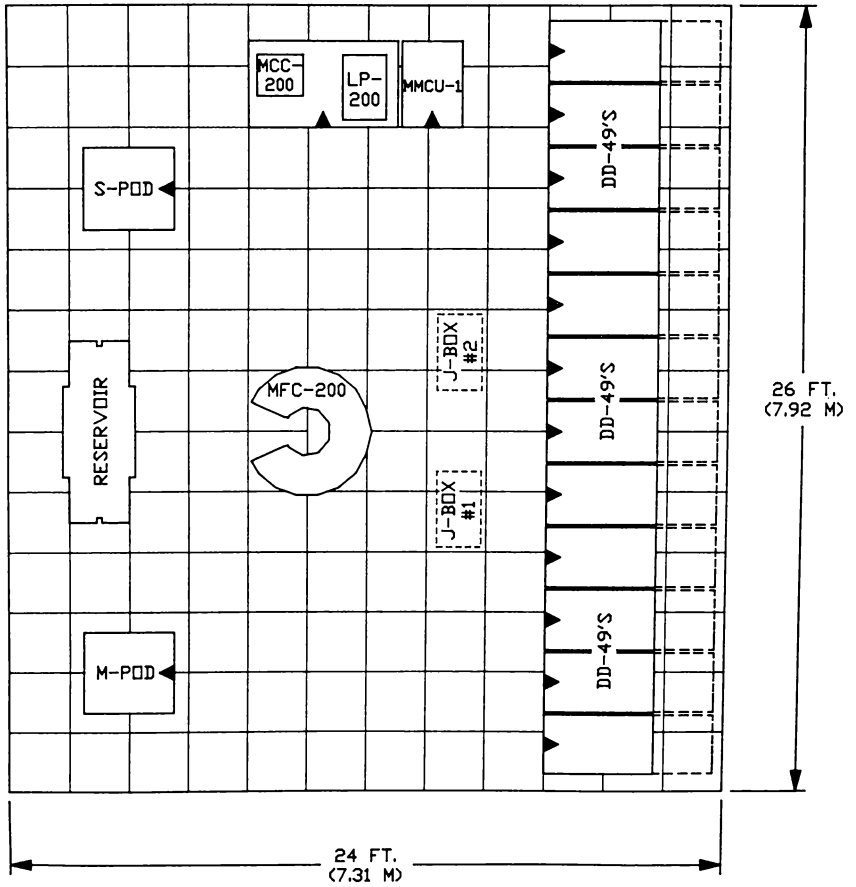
Typical Computer Room Floor Plan for a CRAY-2 Computer System
